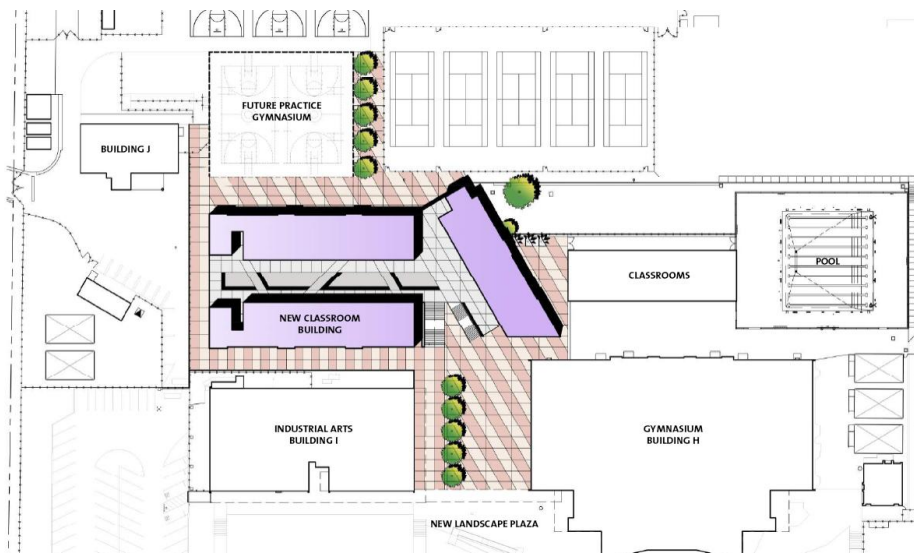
Righetti High School: New 38 Classroom Wing Layout
